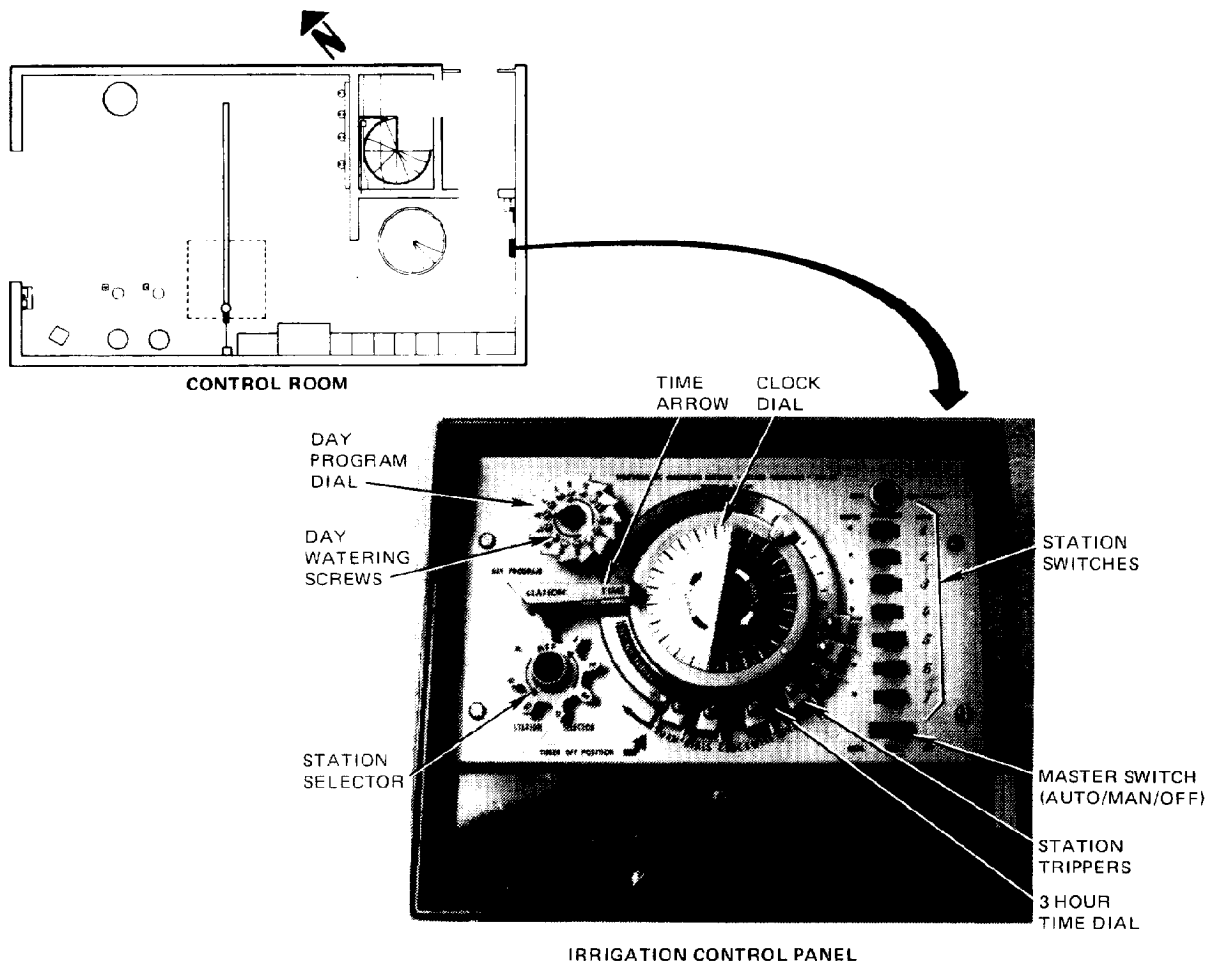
C1 and C2 Water Systems Equipment (Sheet 3 of 3)
